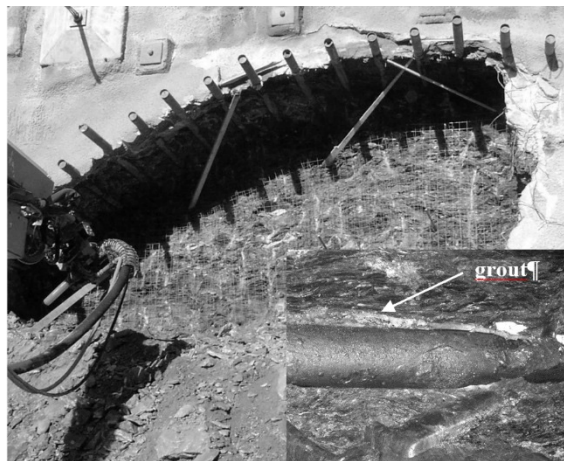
Portal pipe roof umbrella at Birgltunnel (Austria); the detail shows grout filling the annular gap.
